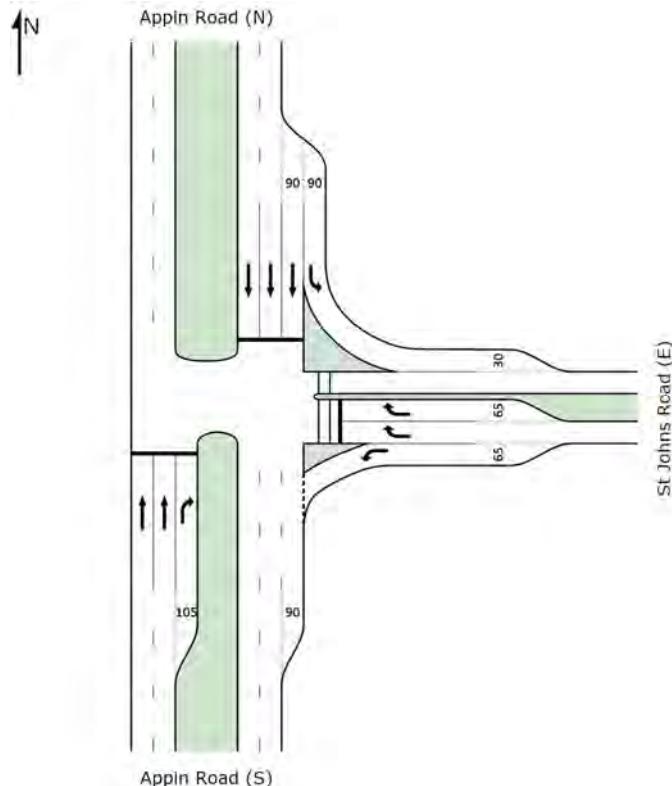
Appin Road and St Johns Road upgraded intersection layout 1
